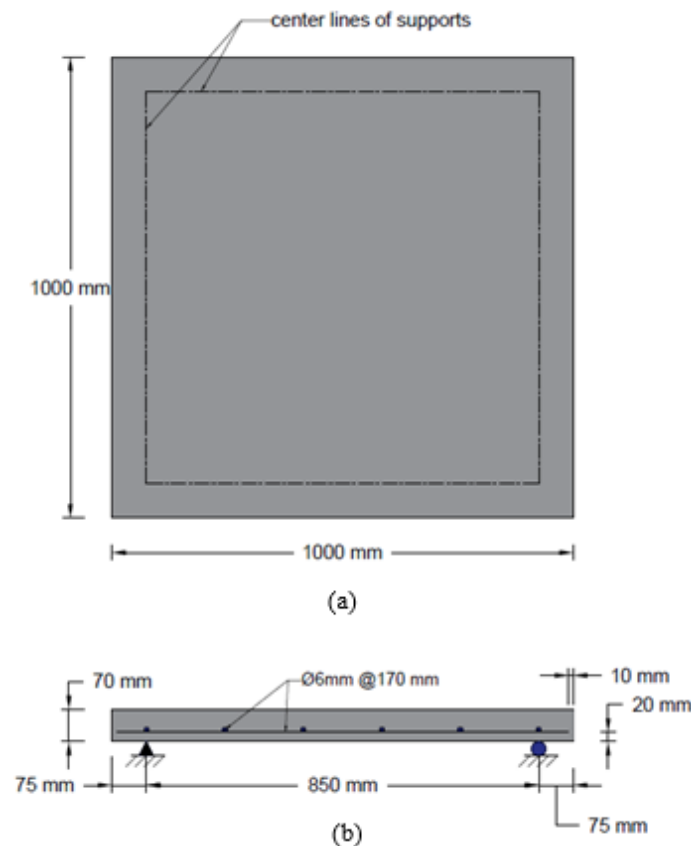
Dimensions and other details of the slab specimens: (a) Top view, (b) Sectional view.
